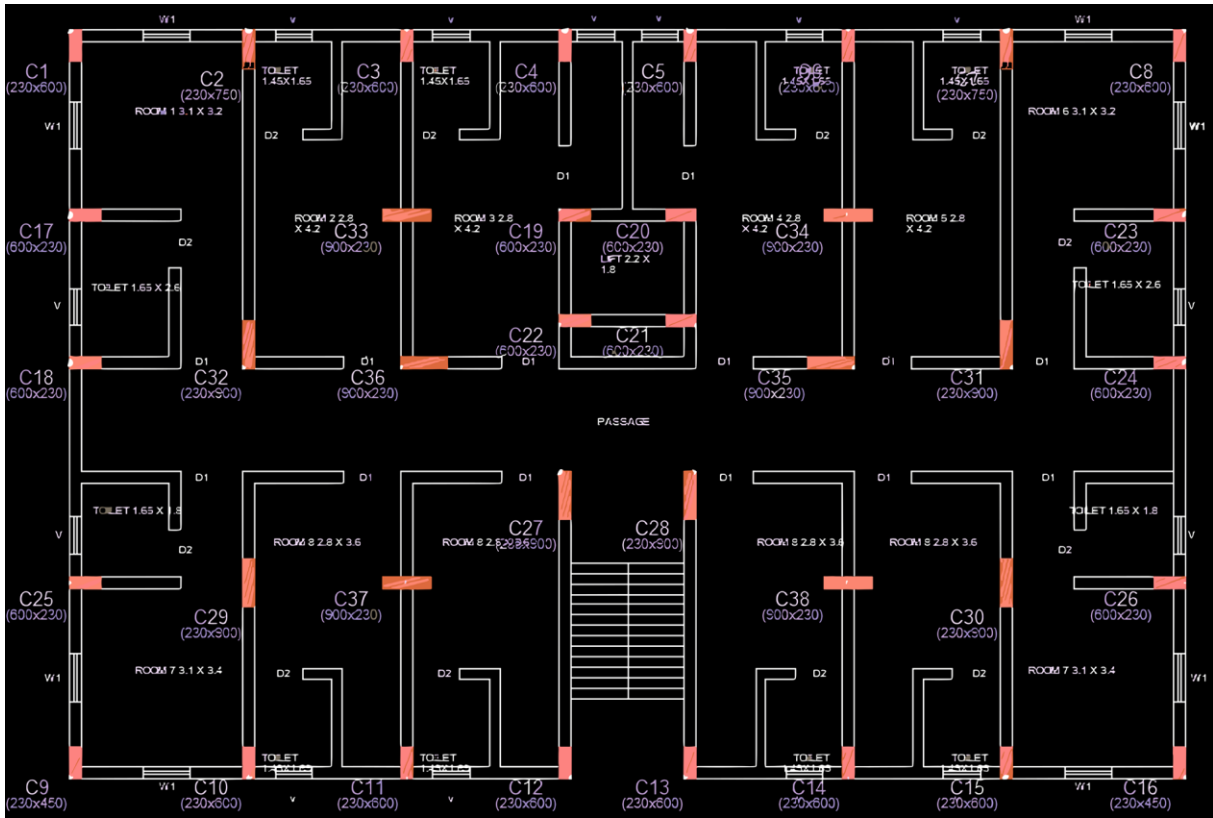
Plan of Case E2 (Steel Fe-500, Concrete – M25)
